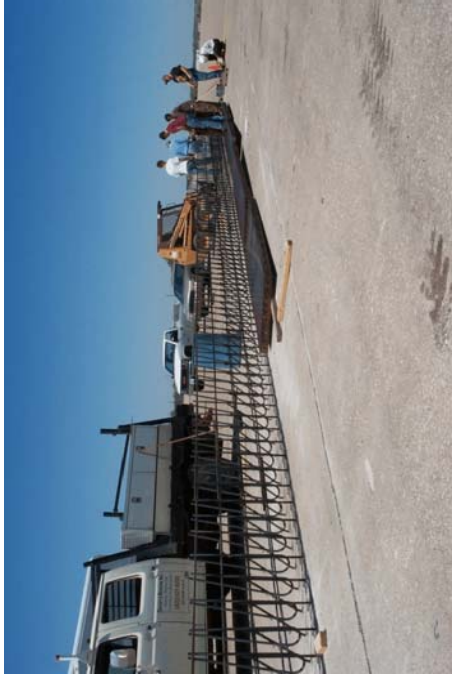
Permanent New Jersey Safety Shape Barrier System Reinforcement
